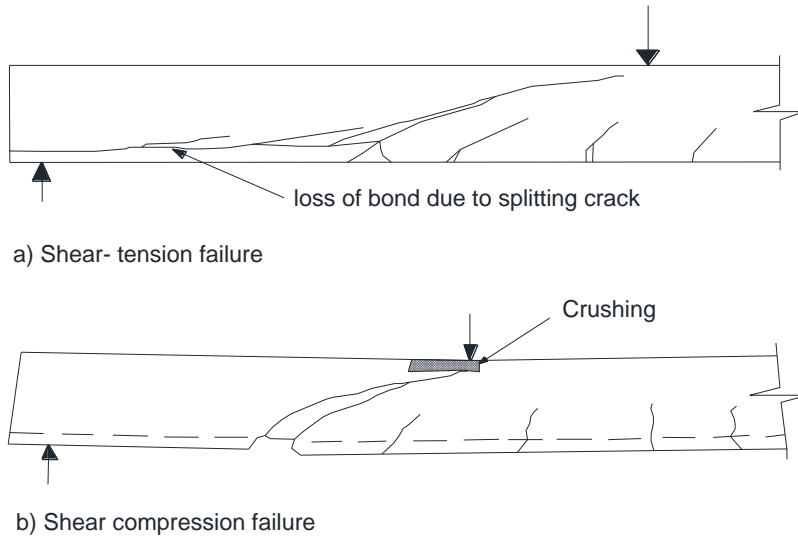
Typical shear failures in short beams (Reproduced from Wight and MacGregor 2011)
